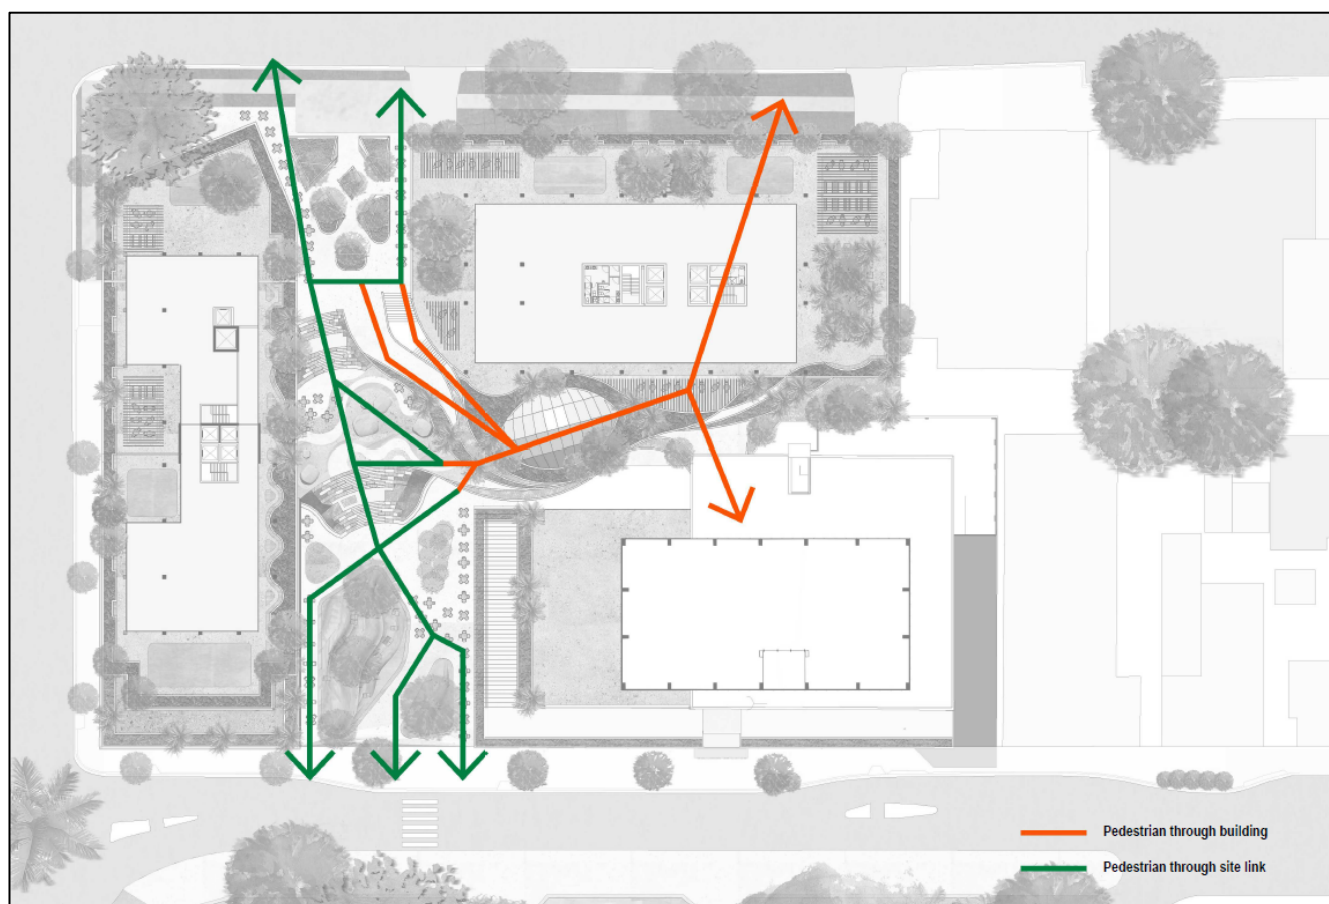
Pedestrian East-West Link through Site (source: Contour Landscape Architecture)
